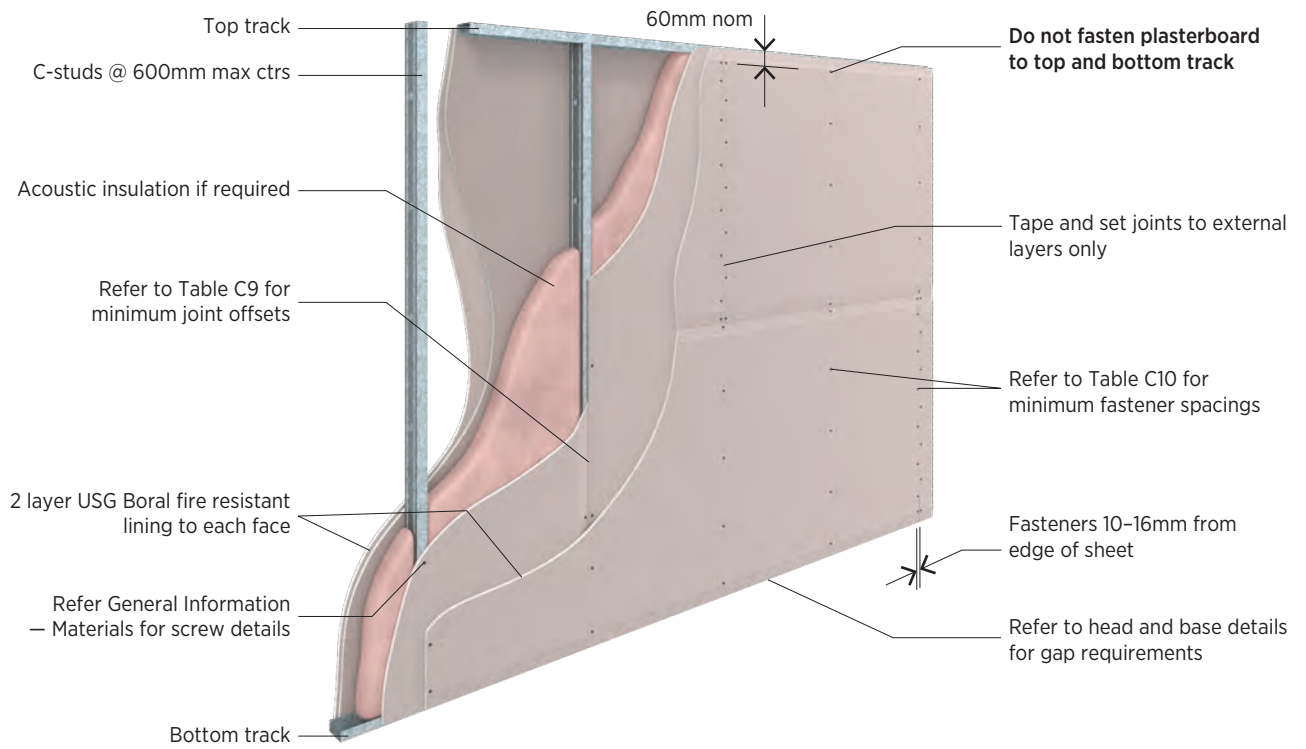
Fire Rated Steel Stud – Mixed Orientation – Multiple Layer
